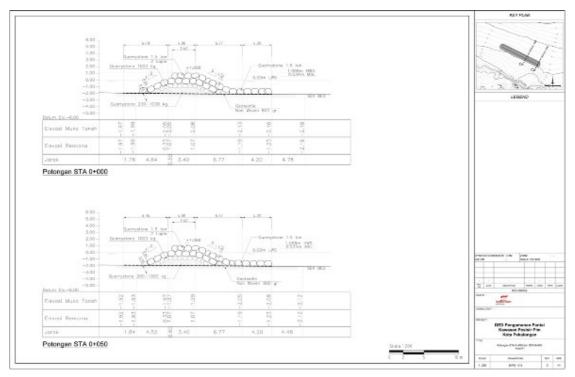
STA 0+000 Cross Section – STA 0+050 Area 1 Breakwater
